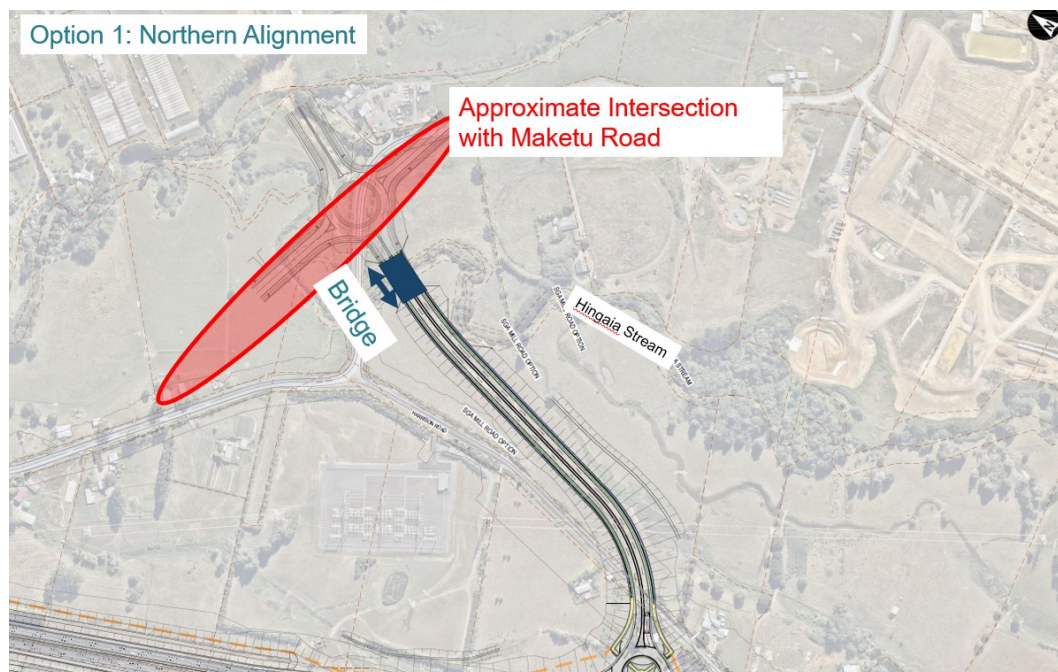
Drury South Interchange Connections Option A Northern Alignment
